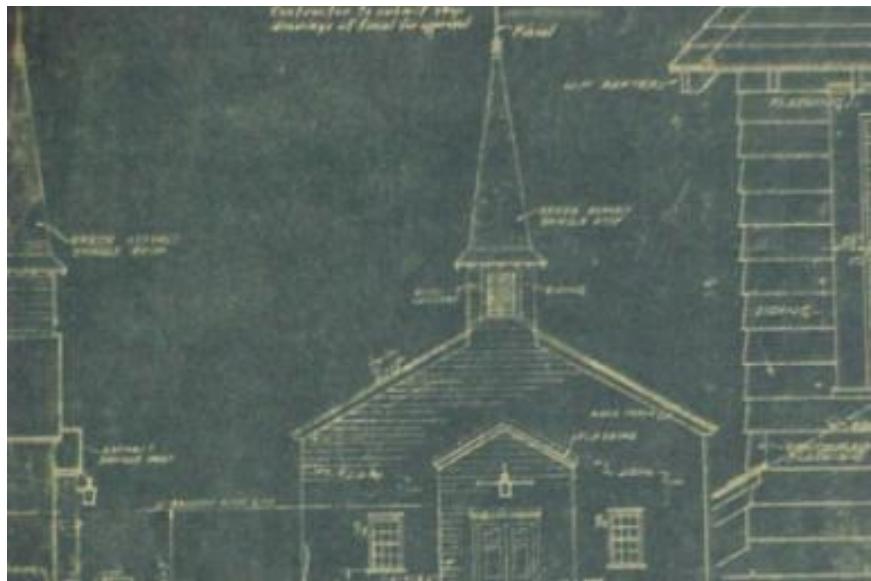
through 36 depict rare blueprint drawings and, for comparison, photos of some of the buildings shown in the drawings. Figures 21 and 22 are typical elevation drawings. Figure 23 is a drawing of the chapel. Figures 24 and 25 show the interior and exterior of the chapel in 1957. Figures 26 and 27 show two views of the chapel as it looked in 2013. Figures 28 through 34 are more blue line drawings. These drawings are especially rare because they dated 1942. Unfortunately, these building no longer exist.
